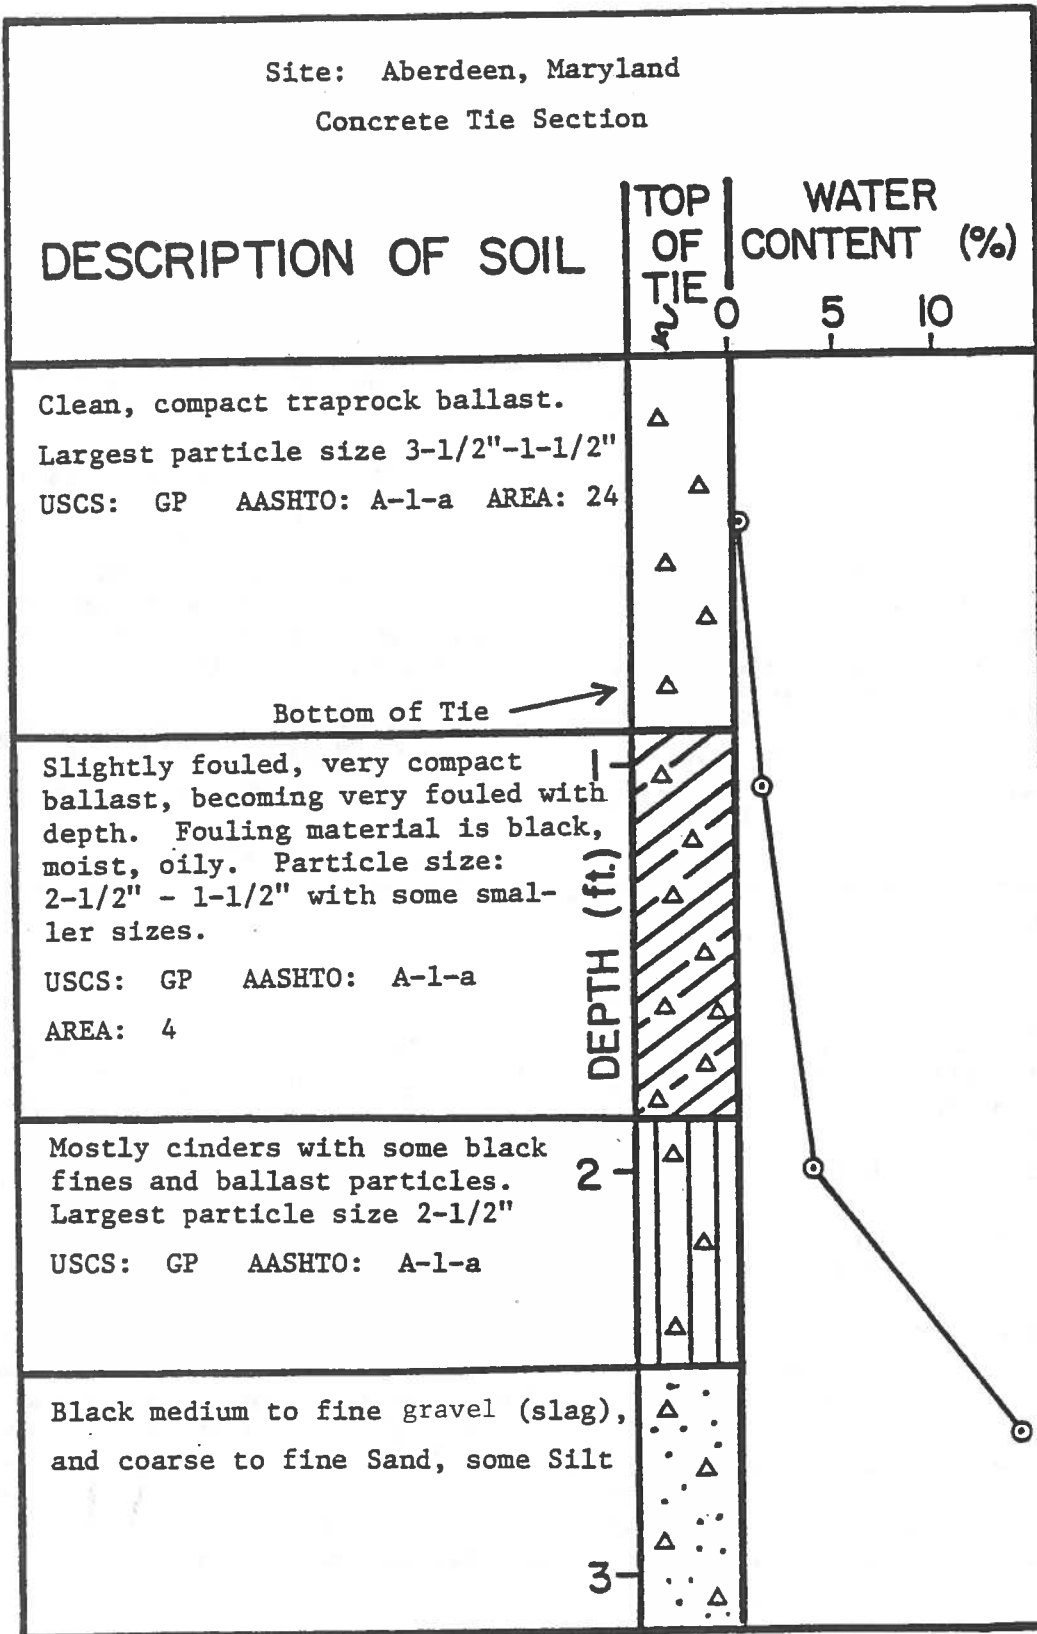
BALLAST PROFILE FOR ABERDEEN CONCRETE TIE SECTION
